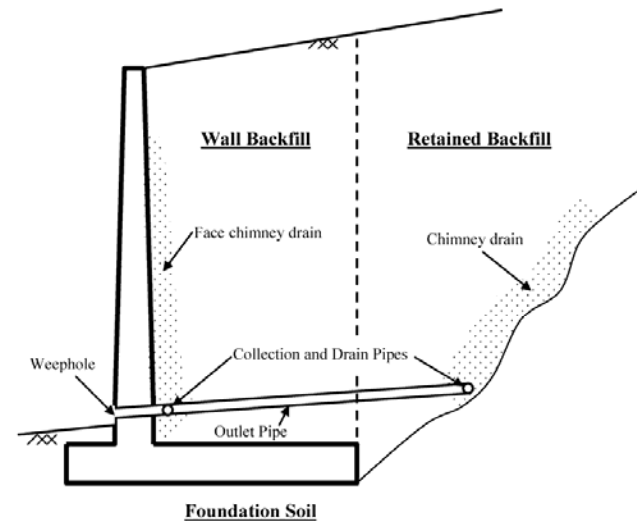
Drains behind backfill in cantilever wall in a cut situation.
